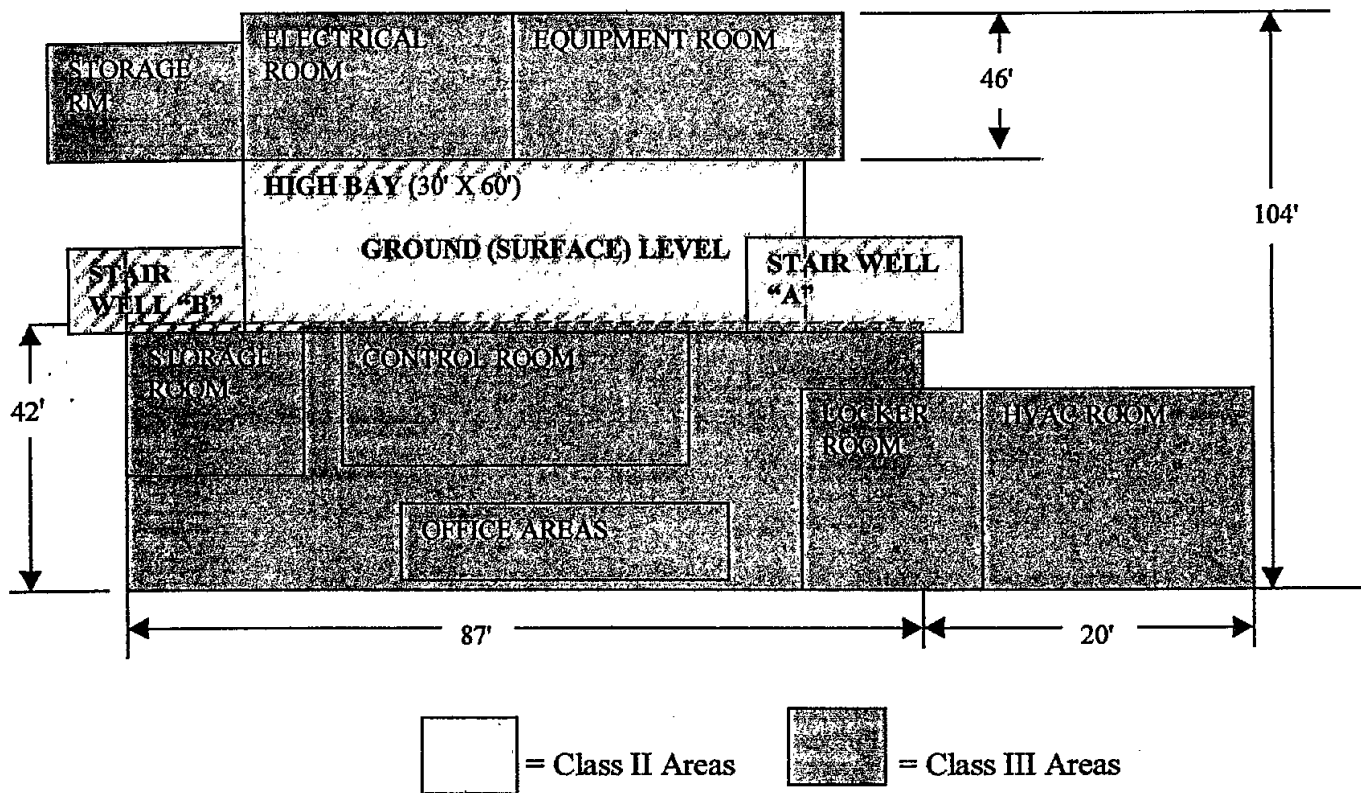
CLASS II AND III FLOOR PLAN (GROUND FLOOR LEVEL)
